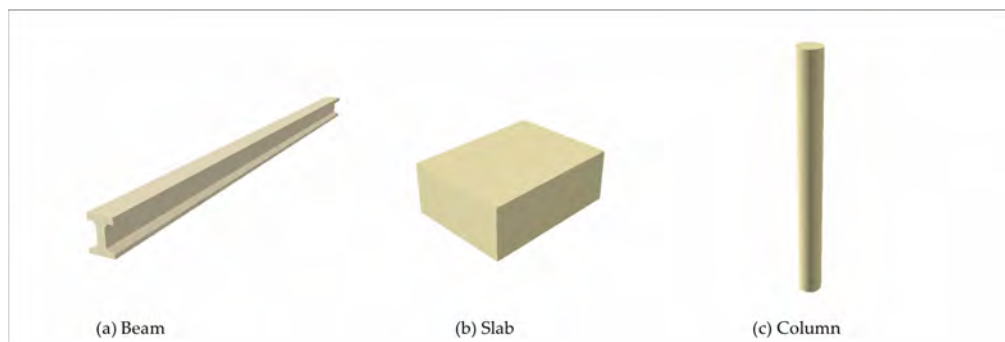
Extruded (a) beam, (b) slab, and (c) column.
